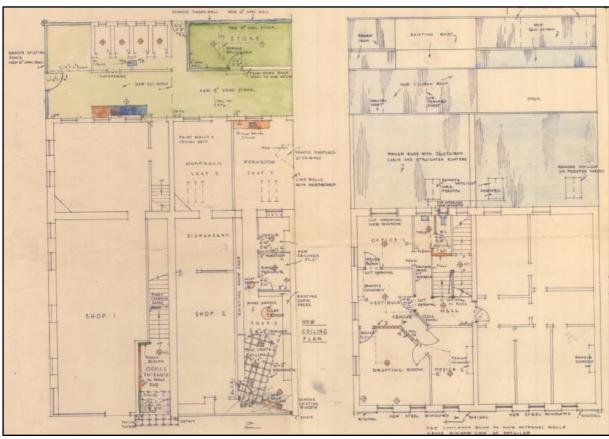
Detail from 1962 plan, showing alterations to the ground floor plan (left) and second floor plan (right) of Watson's Building at 8-14 Tay Street (Barham & Barham, 1962).
